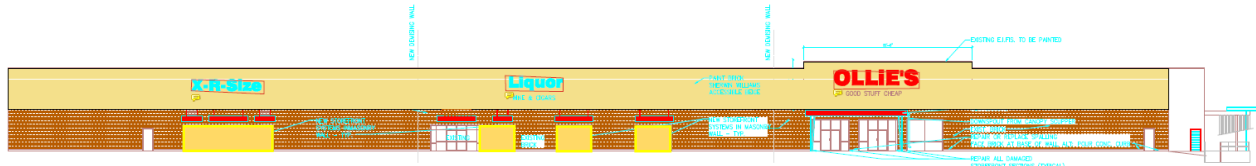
Location of new transparent areas (windows, glass storefront doors, etc.) on the front elevation of the building.
